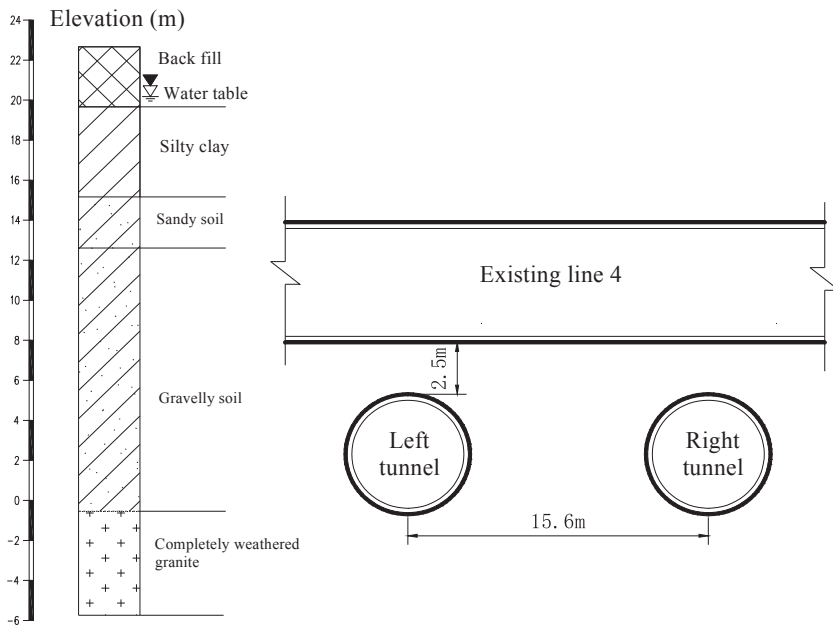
A typical cross-section showing the existing tunnels, the new twin tunnels, and the soil profile.
